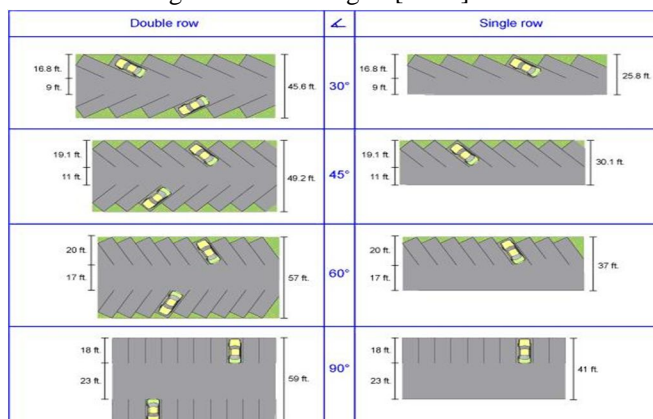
30° parking, 45° parking, 60° parking, Right angle parking
